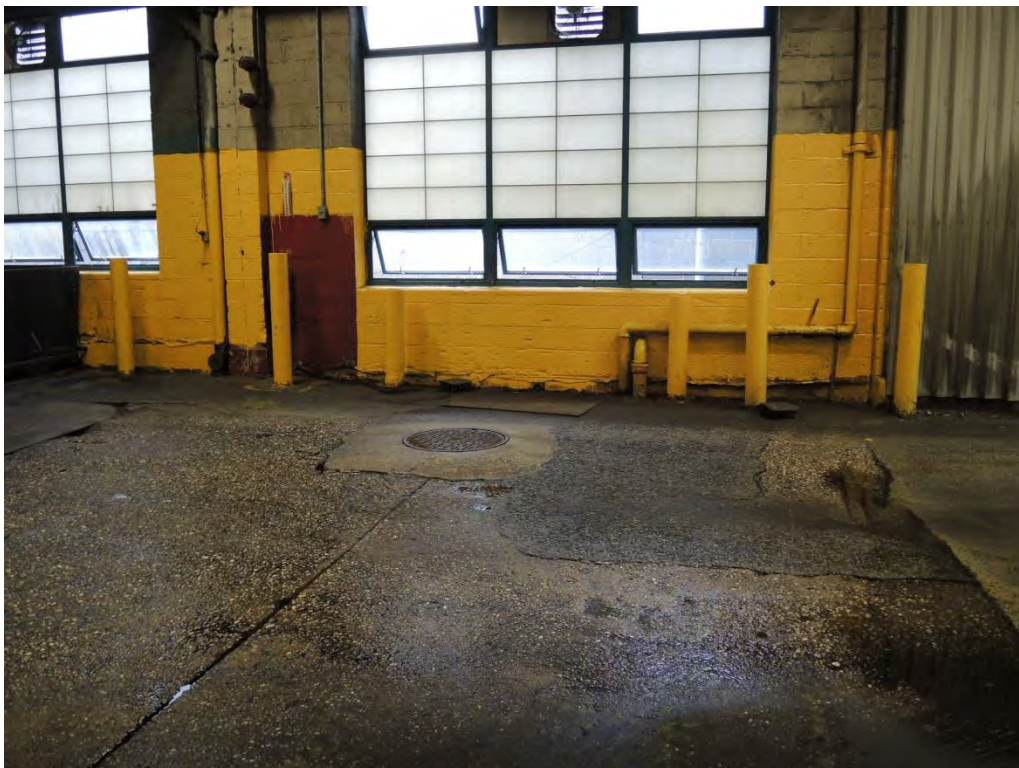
Lot 46, rear of Jamaica Bus Depot. Manhole in street marks approximate former location of creek channel, which ran along the northeastern side of Lot 46. View looking northwest from 107<sup>th</sup> Avenue.
